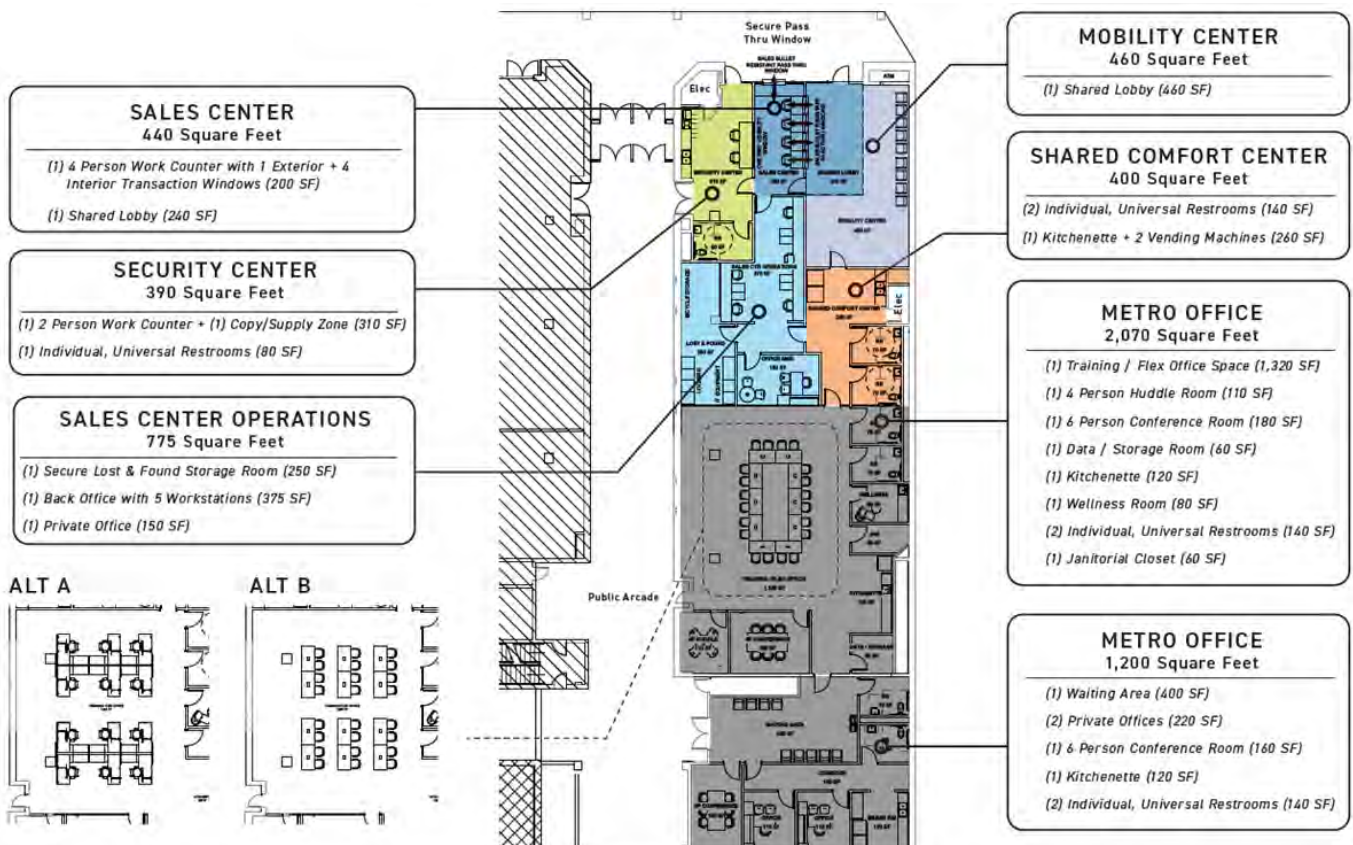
Customer Fulfillment and Mobility Center Floor Plan
